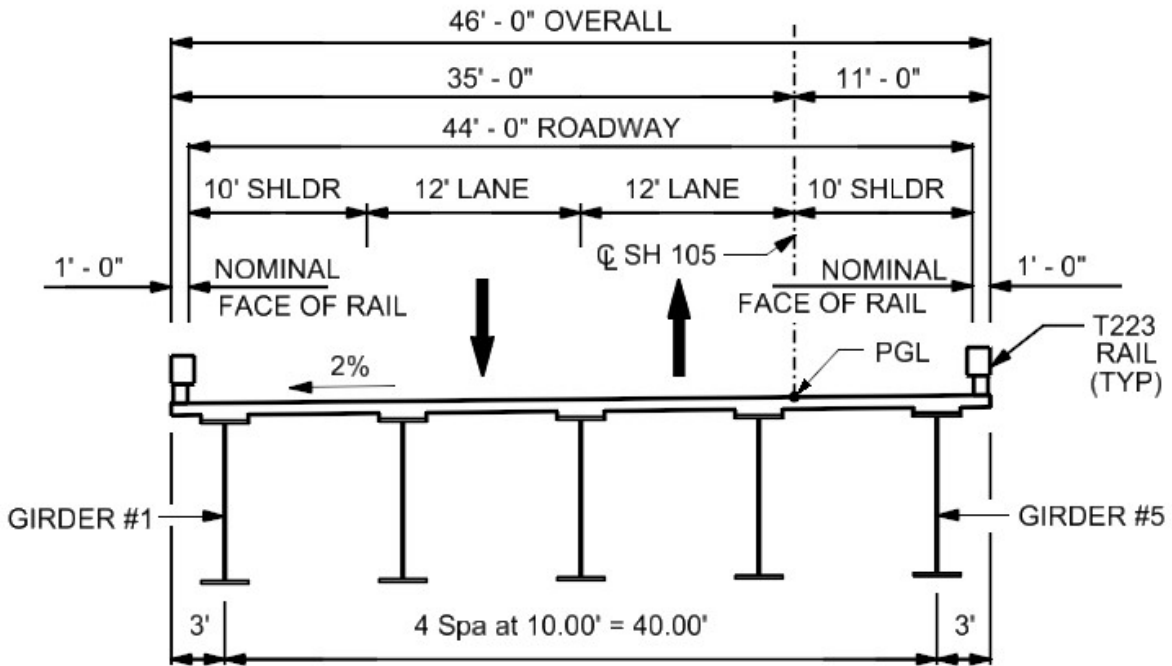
Typical Transverse Section on SH 105 Bridge
